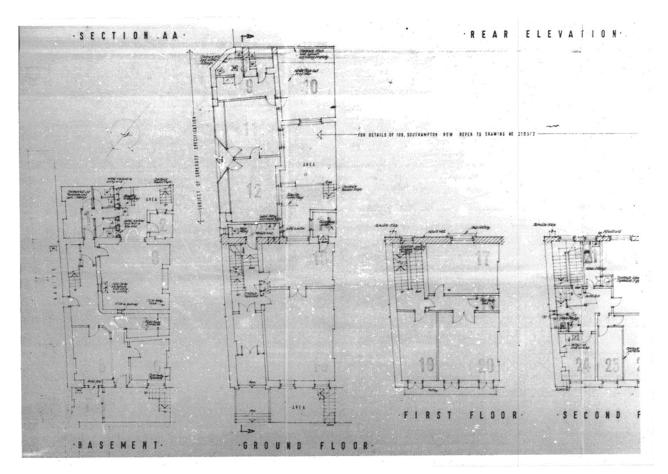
Floor plans of no. 60 Russell Square dated 1967 showing the layout of the ground floor in the late-1960s (Source: Camden Archive).
